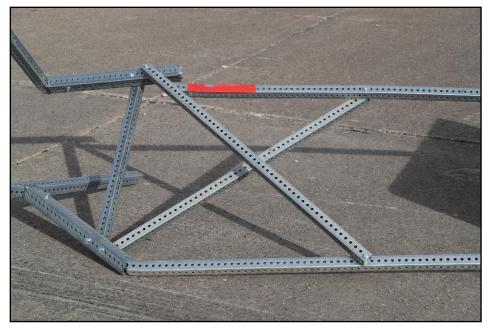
Lower Half of the Tall Sign Supports for Aluminum Signs after Test 618901-01-2-6.
